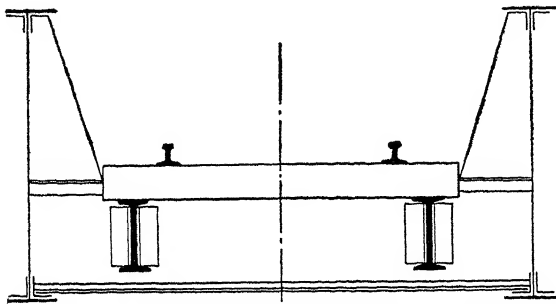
Cross-Section of Through Plate-Girder Railway Bridge.
